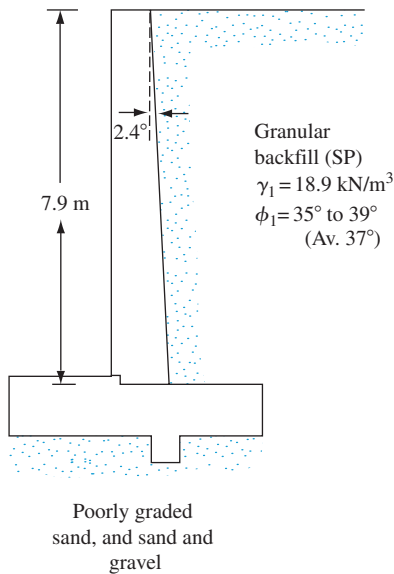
Schematic diagram of the retaining wall (drawn to scale)
